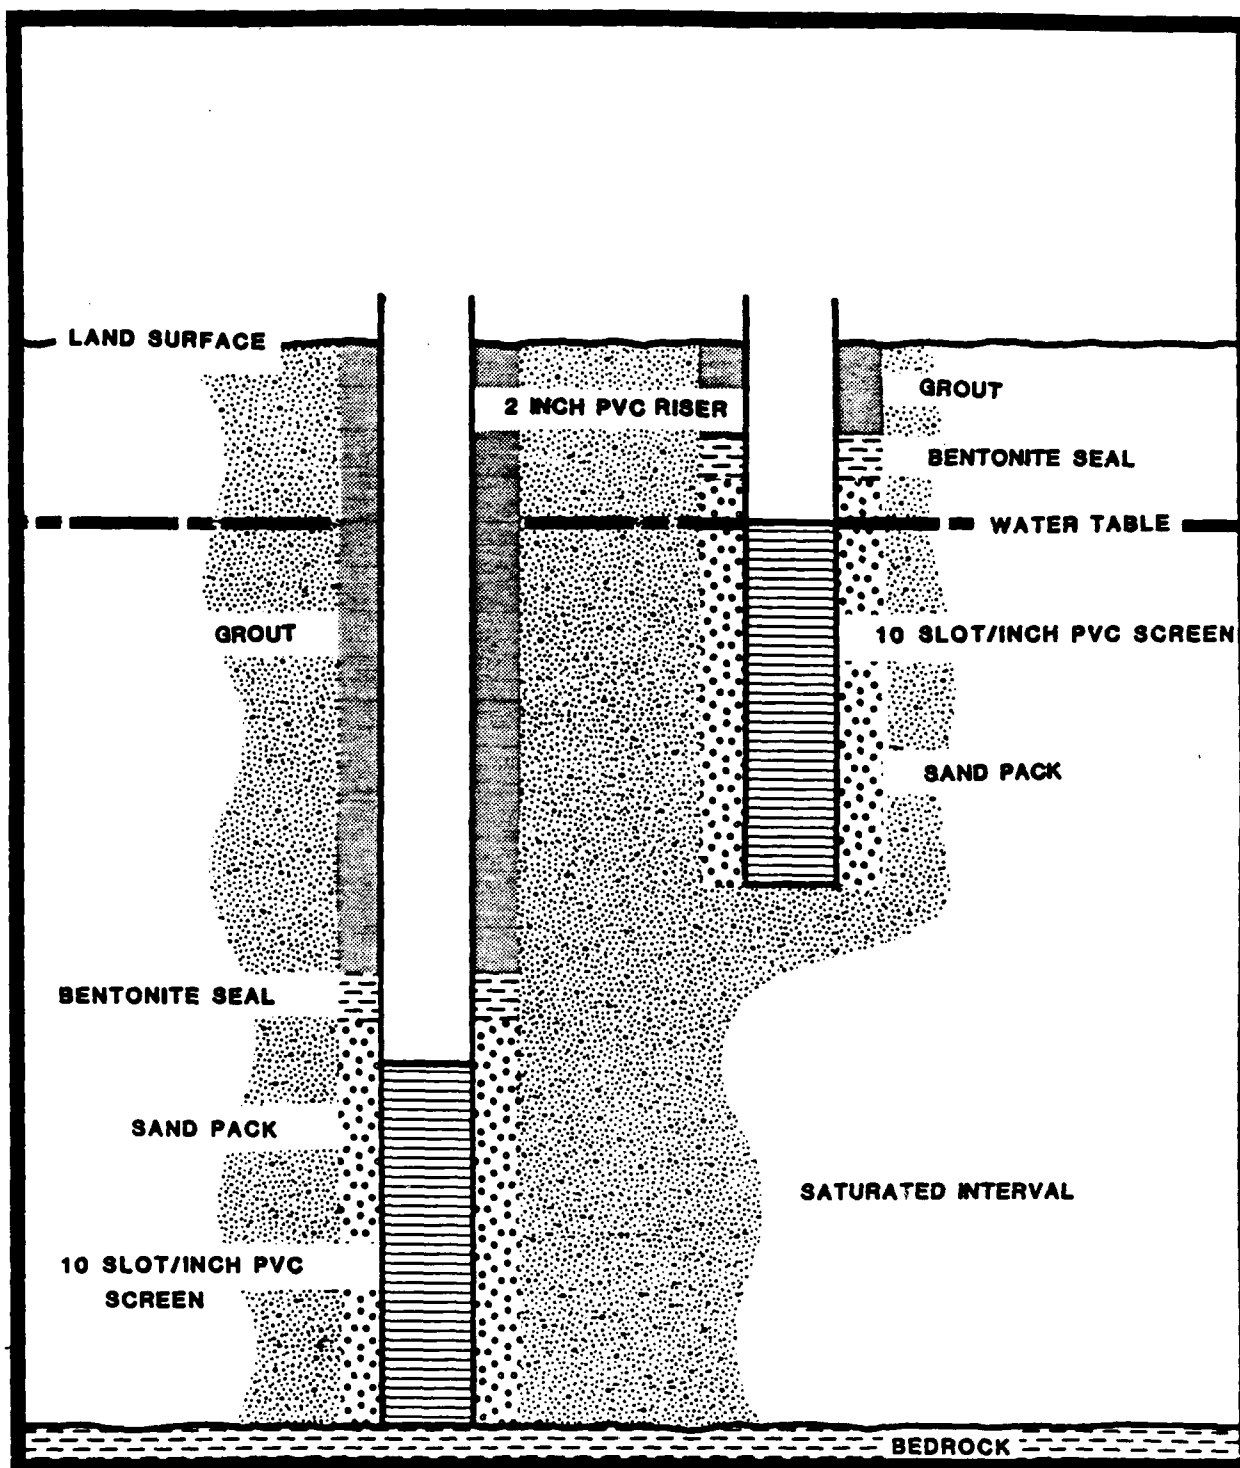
TYPICAL WELL PAIR INSTALLATION
